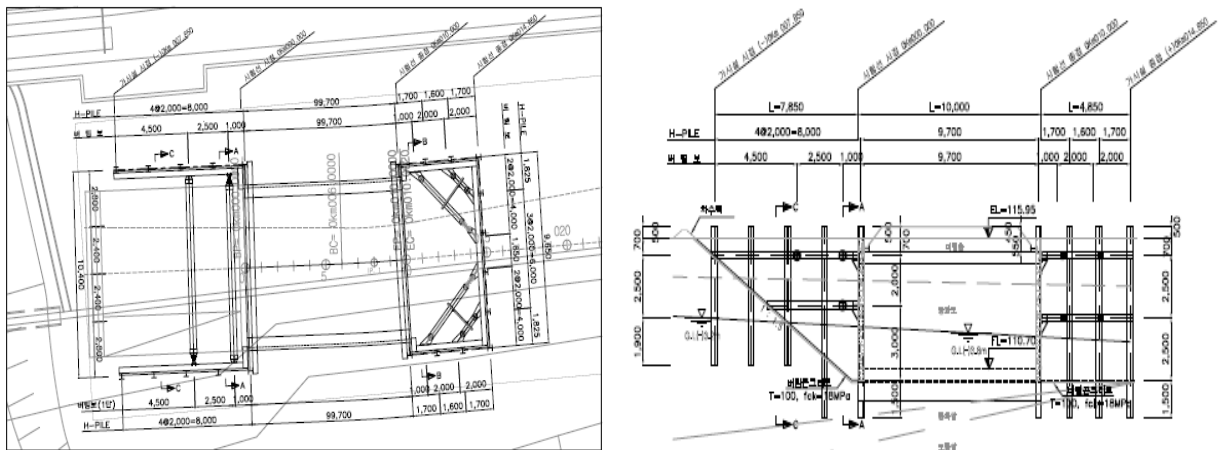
Longitudinal and sectional of open-cut modular field test construction
